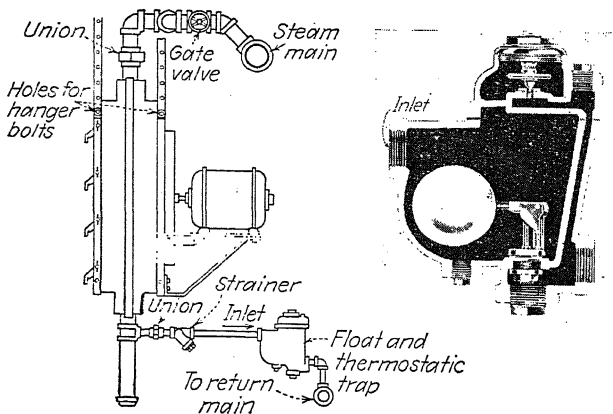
Unit heater connection for a vacuum or vapor steam system, showing detail of a float and thermostatic trap.
